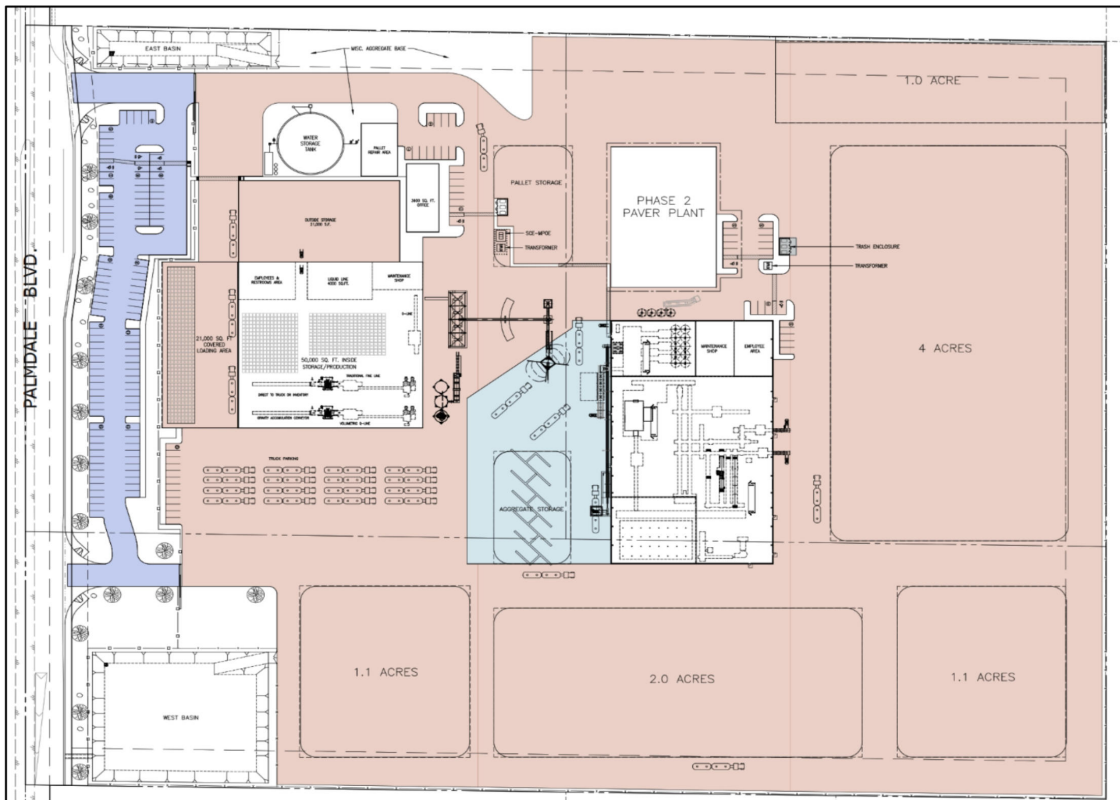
Site Plan – Proposed Concrete Bagging and Pavers Manufacturing Plant, Palmdale, CA
